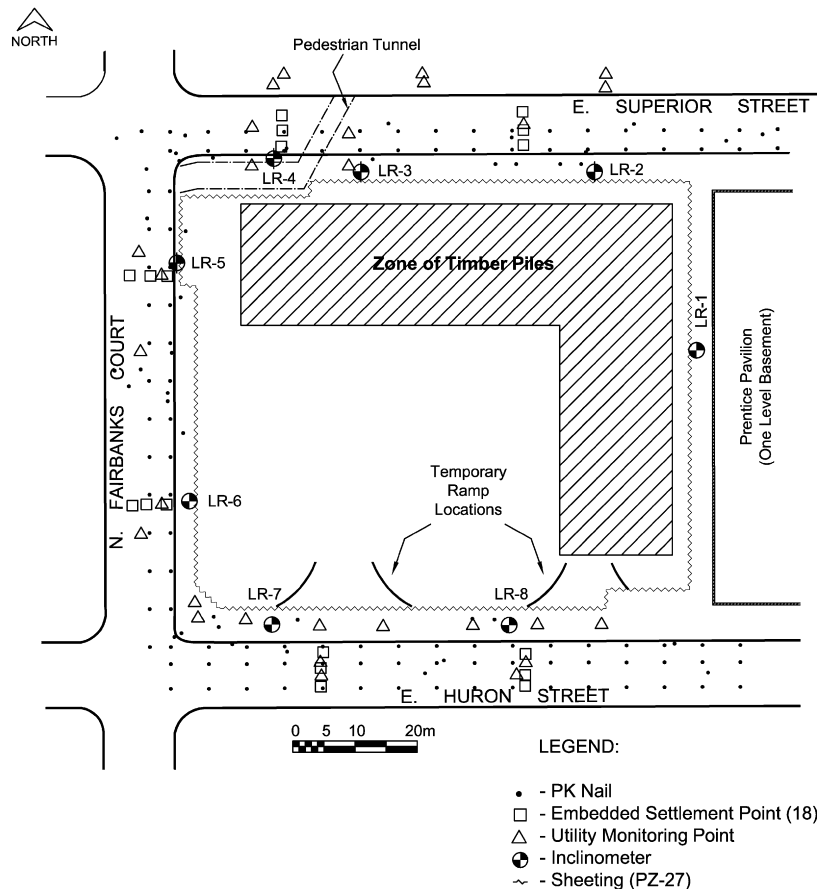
Plan view and instrumentation layout in Lurie Center [6].
